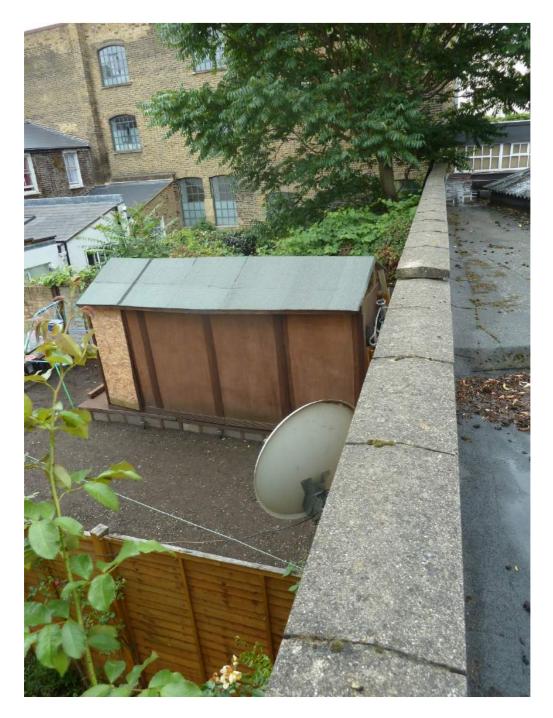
site A East Boundary wall with Ash tree 3 Storey Building in background abuts wall
